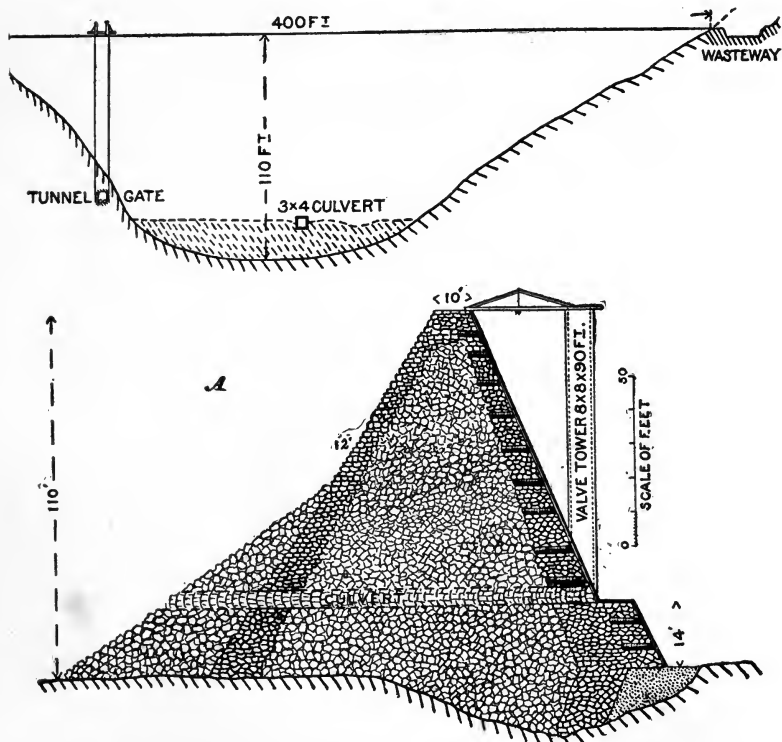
ELEVATION AND CROSS-SECTION OF WALNUT GROVE DAM.
